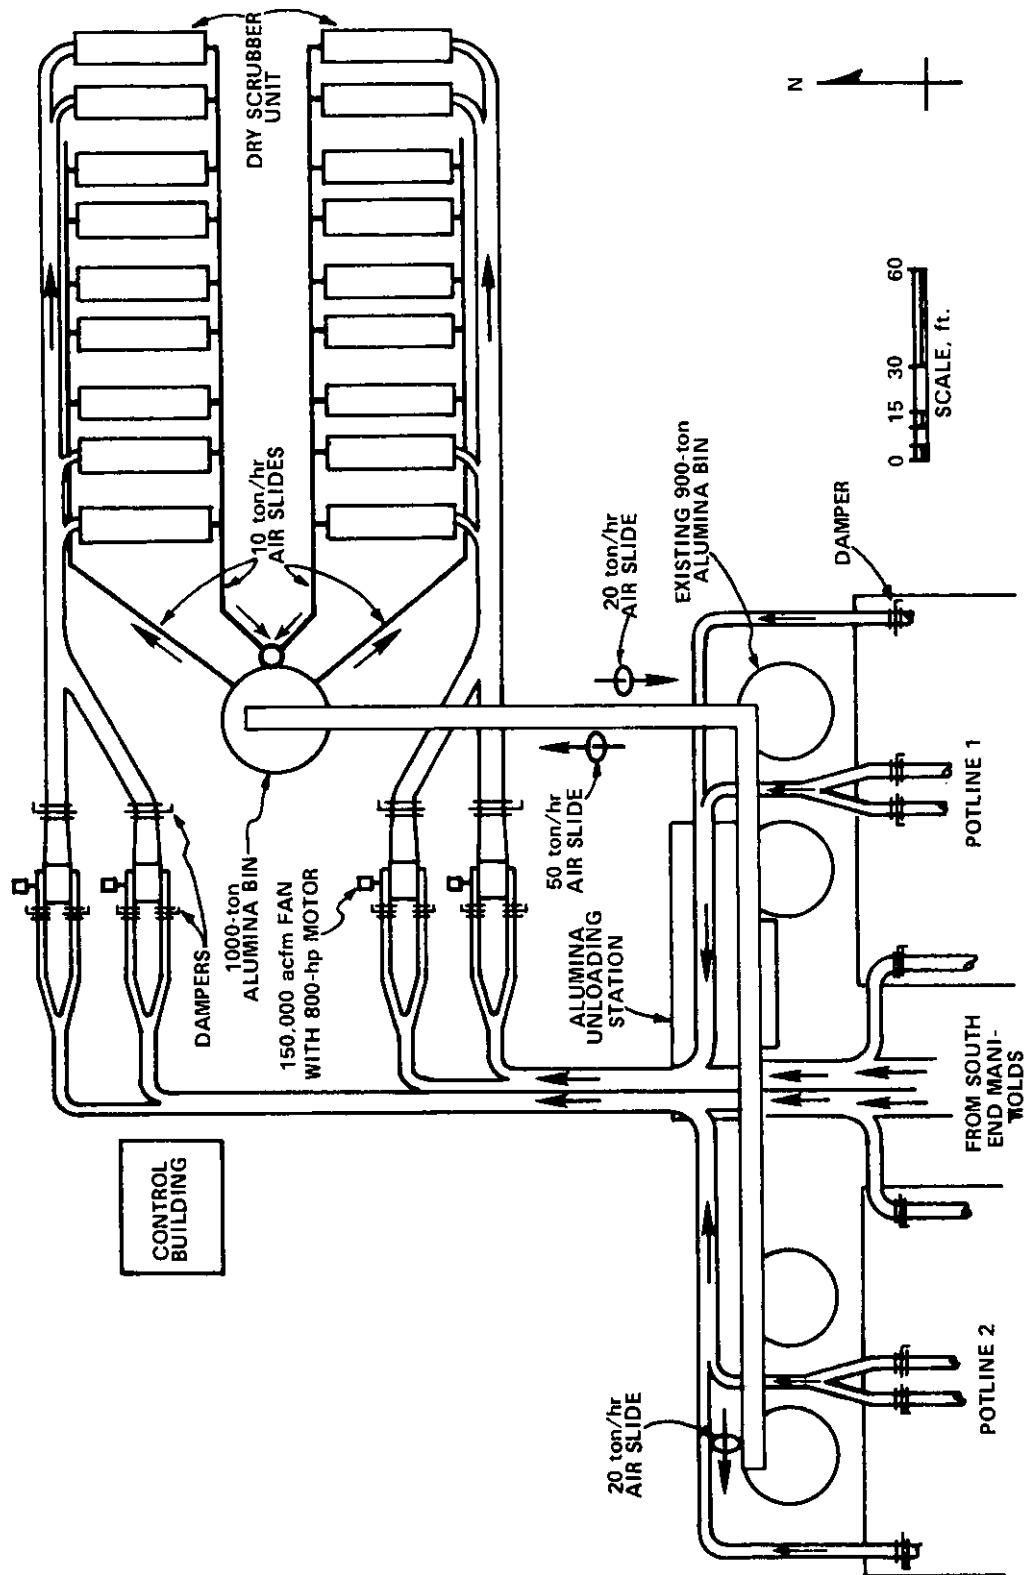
Retrofit layout -- plant A -- lines 1 and 2.
